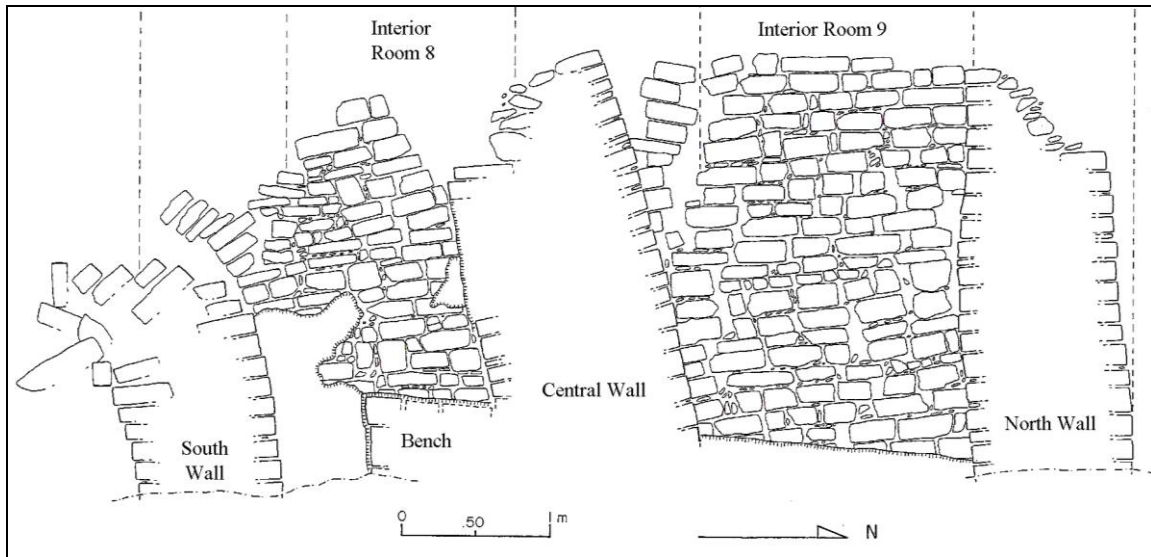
East profiles of rooms 7 & 8, Structure L7-9 (Drawing by L. Luin, VCAP)
